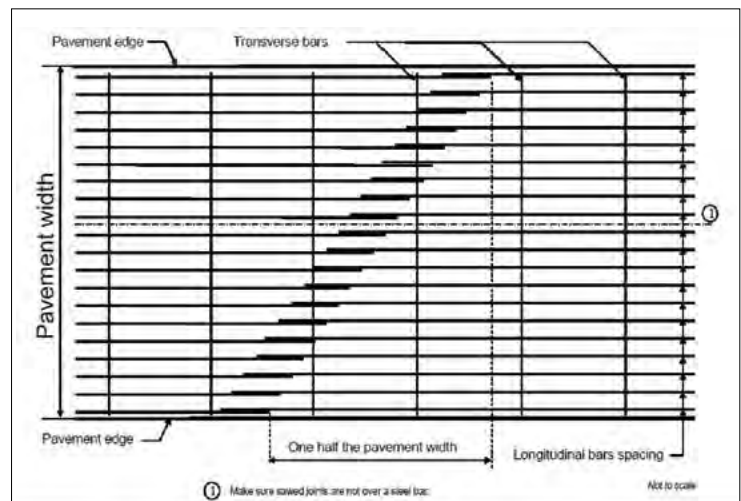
Typical layout pattern for longitudinal steel with laps skewed across pavement.
